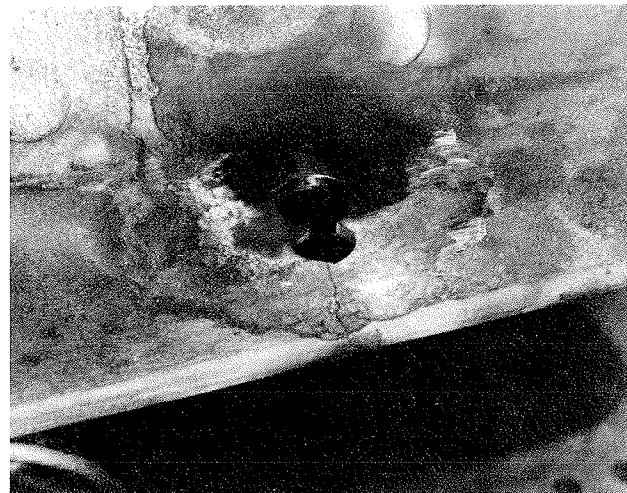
Corroded area of test beam 4 with crack, reinitiated after having holes drilled.
